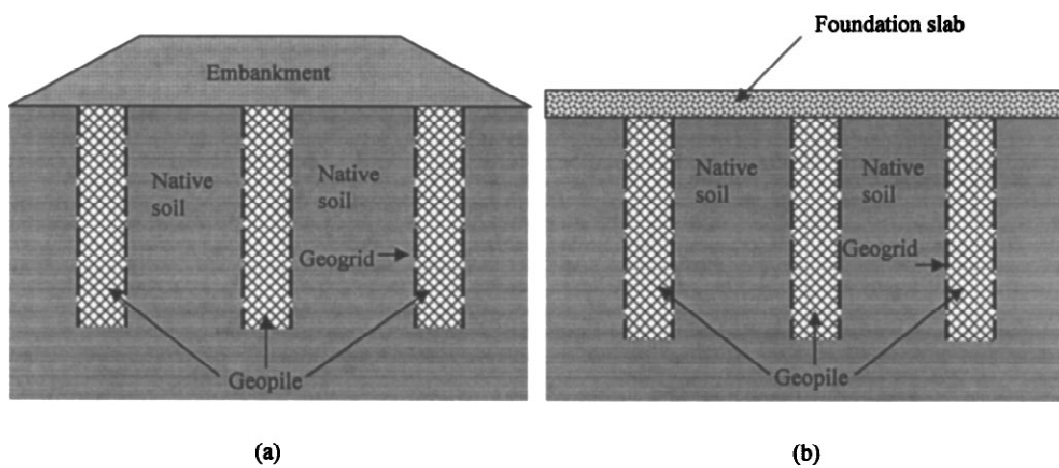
67 Geopiles for Embankment and Building Foundations (Al-Omari and Hamodi, 1991)
